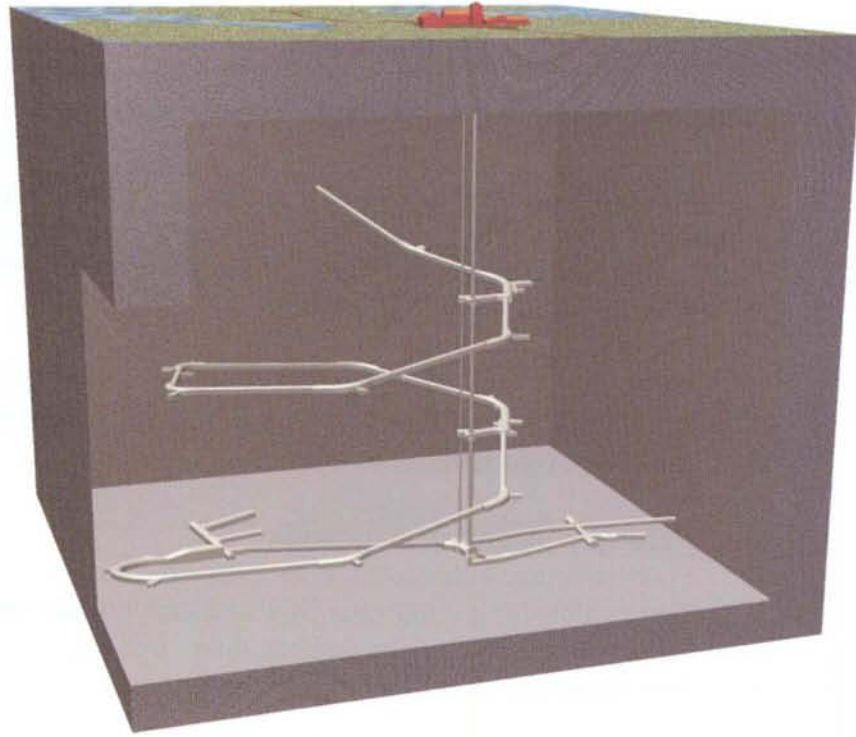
General layout of the Äspö HRL. The total length of the tunnel is 3600 m. The first part of the tunnel was excavated using the drill-and-blast technique. The last 400 metres were excavated by a Tunnel Boring Machine (TBM) with a diameter of 5 metres. The underground excavations are connected to the Äspö Research Village, containing offices, stores, hoist and ventilation building, by a hoist shaft and two ventilation shafts.
